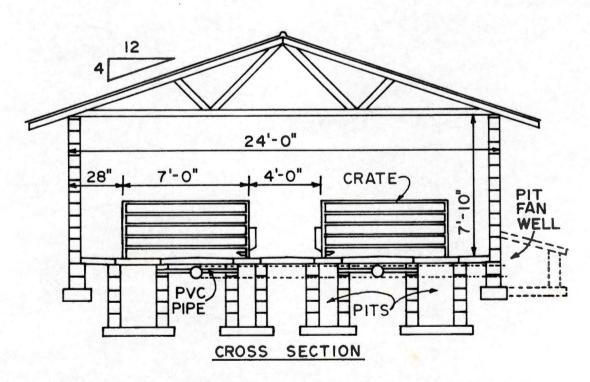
Farrowing House with PVC Pipe Pit Ventilation System.
